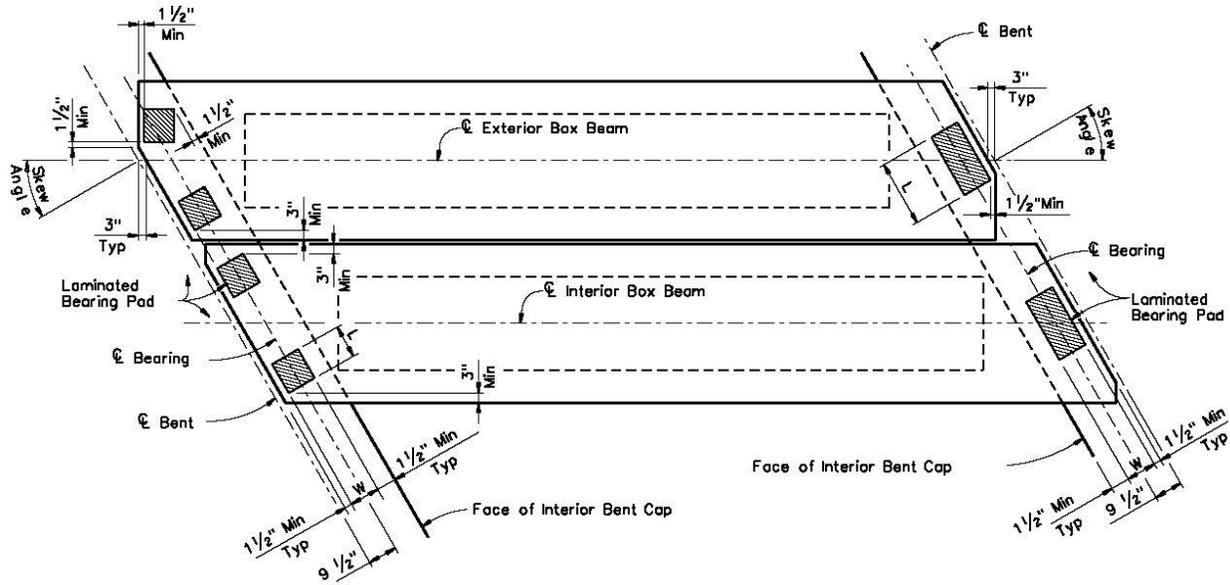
Plan of two adjacent boxes of the NASA Road 1 bridge in Texas (PCI 2007)
